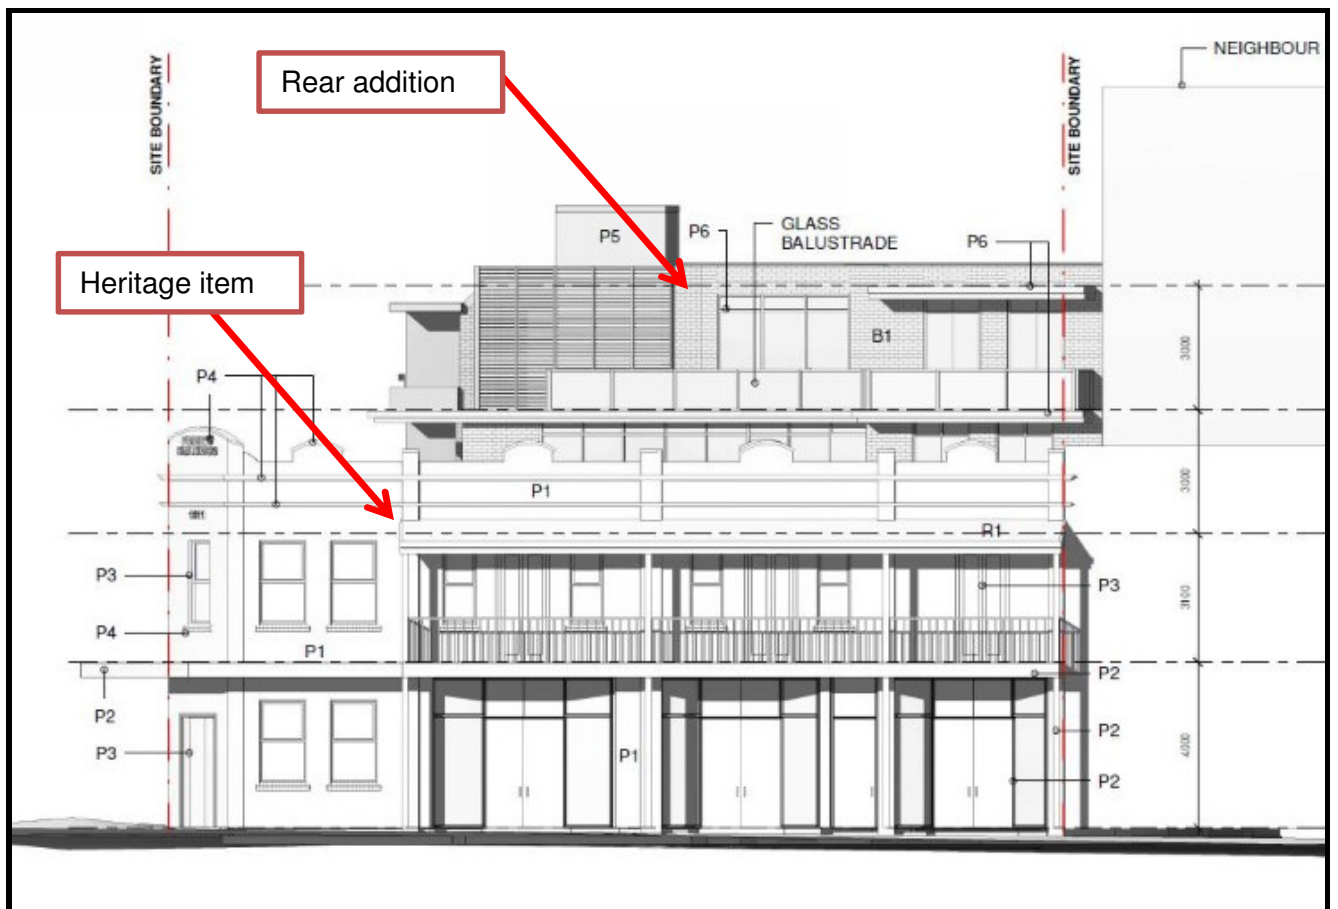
Proposed Southern (Bay Street) Elevation (Source: Giles Tribe Architects, 16 December 2016)
